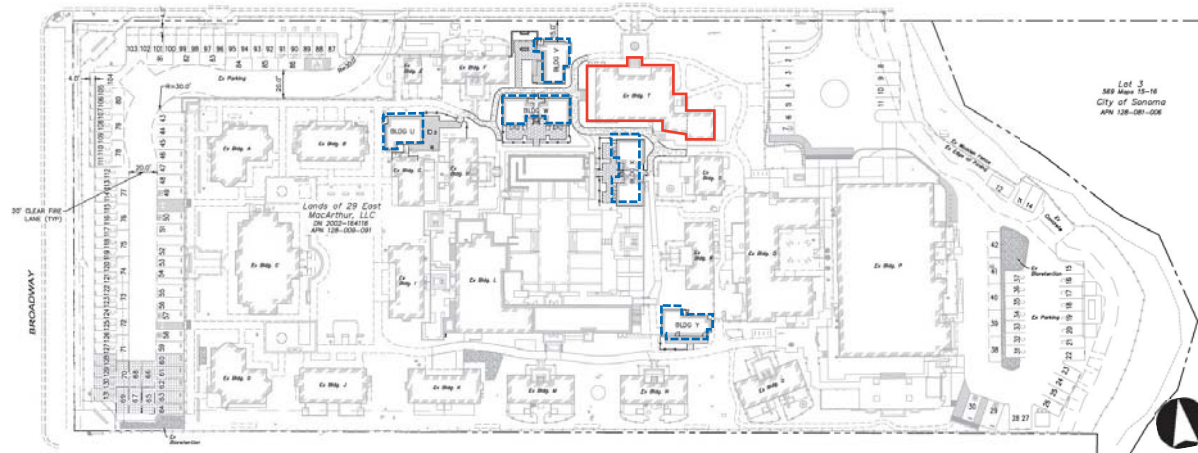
Site plan illustrating the subject property. The historic Burriss House (Building T) is outlined with red. Proposed infill buildings U, V, W, X, and Y are outlined with a blue-dashed line. Source: Adobe Associates, Inc., outlines added by Page & Turnbull.
